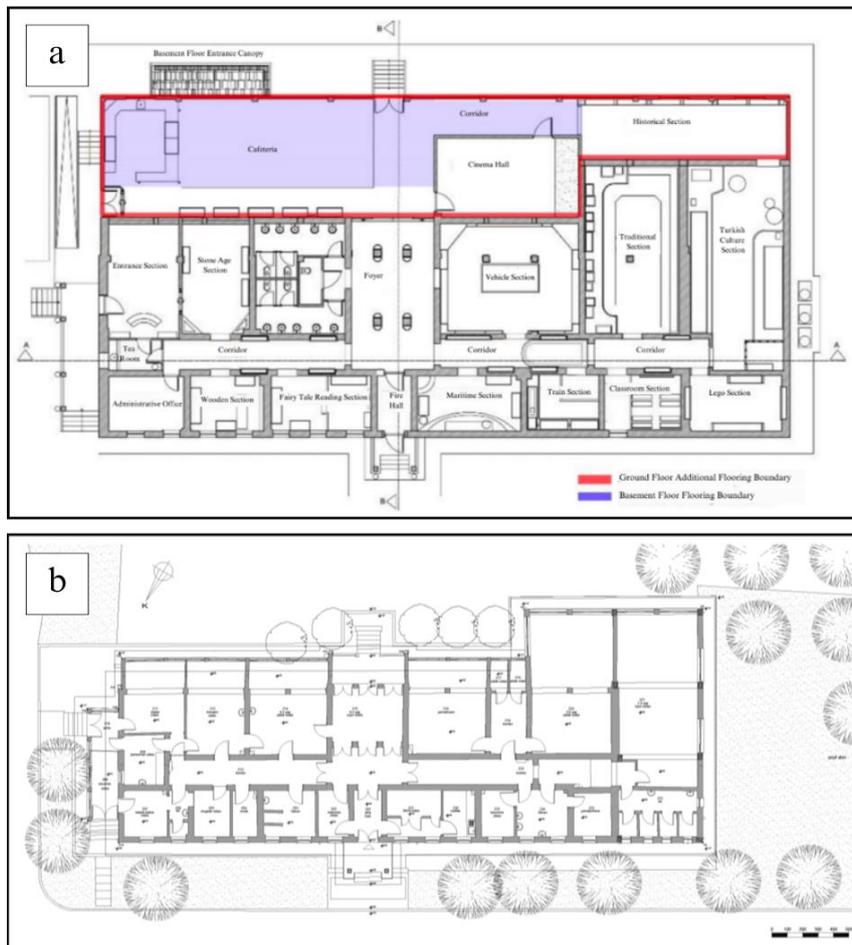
a) Red Line and Purple Area Highlights the Expansions on the Ground Floor (Akış, 2018) , b) Ground Floor Plan Before Transformations (Üreğen Aydoğın, 2019)
